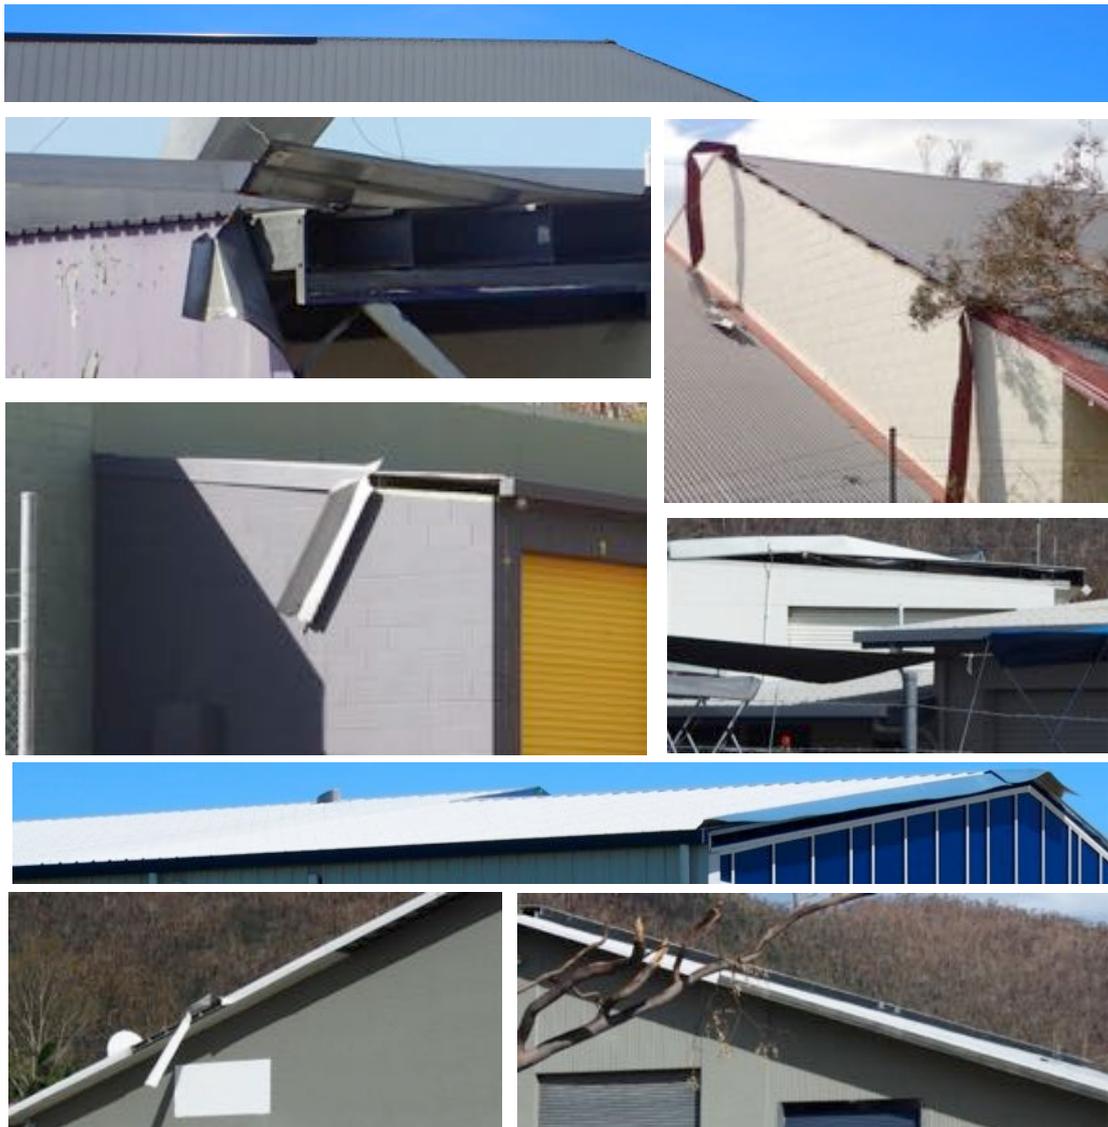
Examples of failure of flashings on larger industrial buildings
